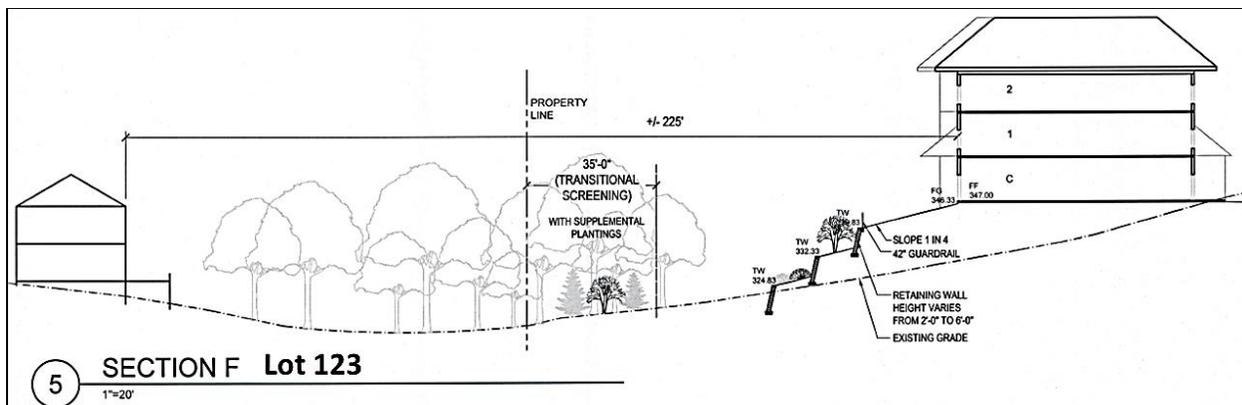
A: Cross-section Lot 123 and the assisted living facility, Source: GDP/SE Plat, Sheet L-3
